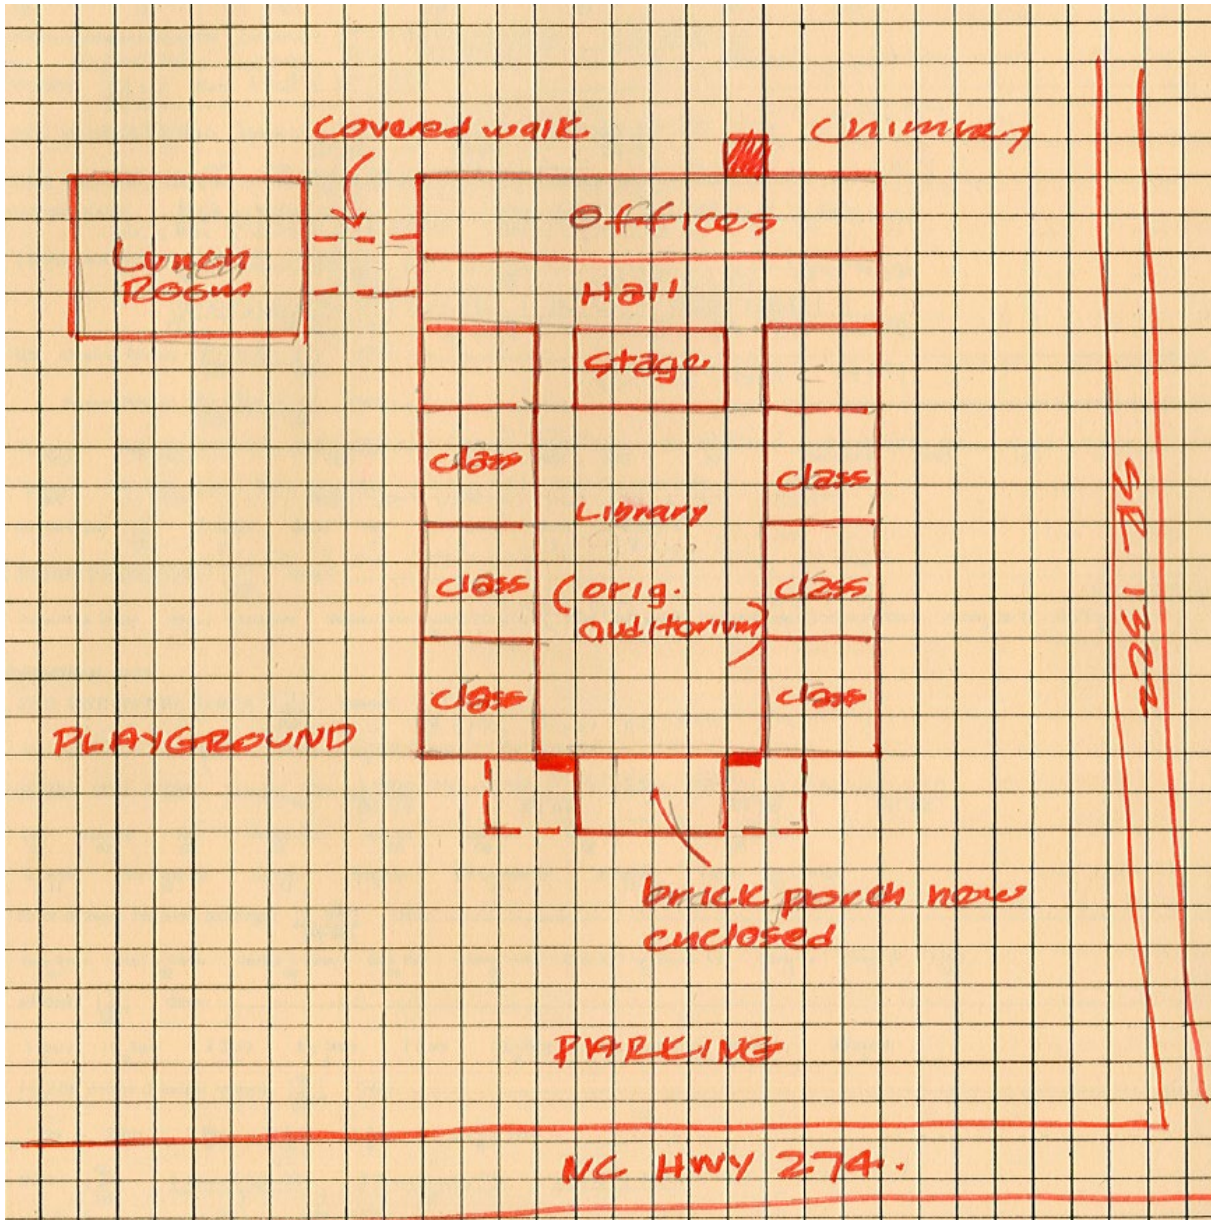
Sketch plan by J. Randall Cotton completed during his 1982 survey of Rock Hill School (WAO488). Drawing is located within the resource’s NCHPO survey file.
